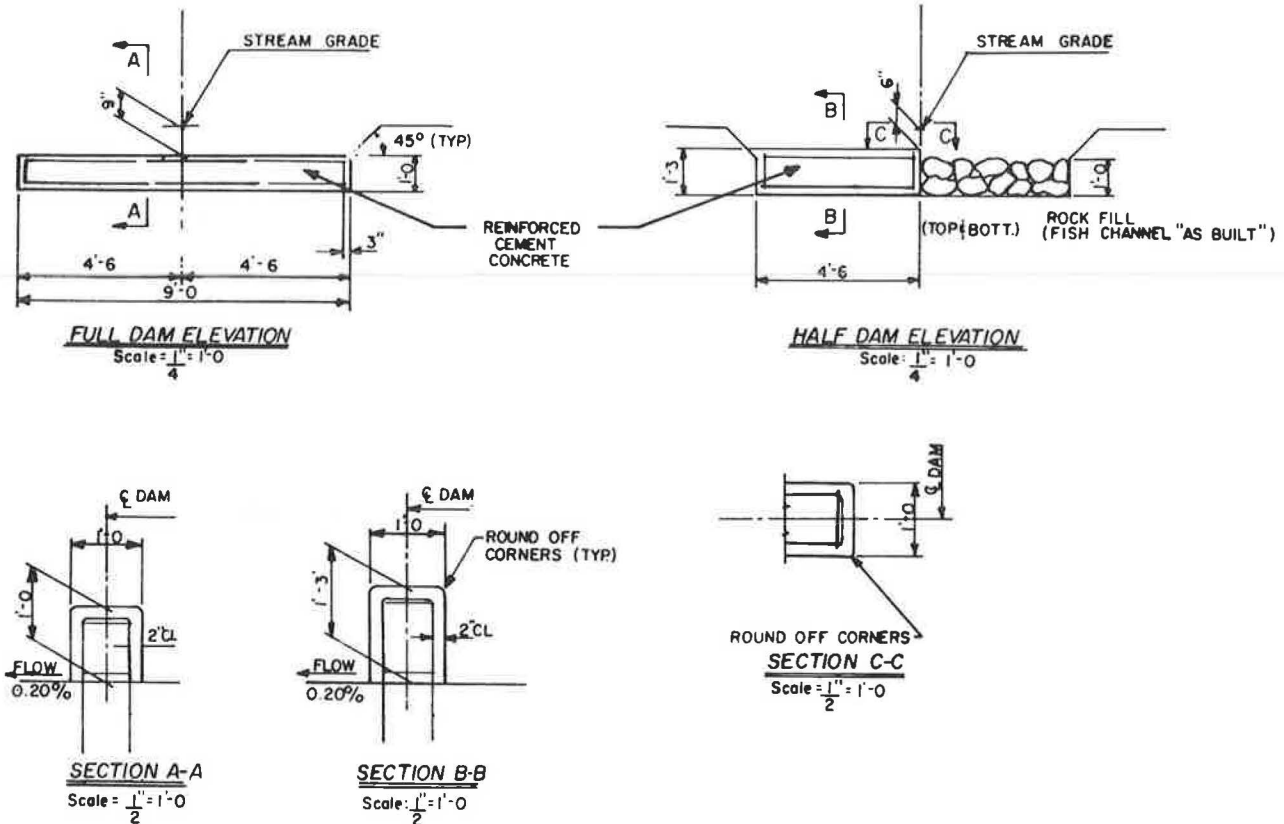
Fish channel dams in Bull Creek arch culvert.
